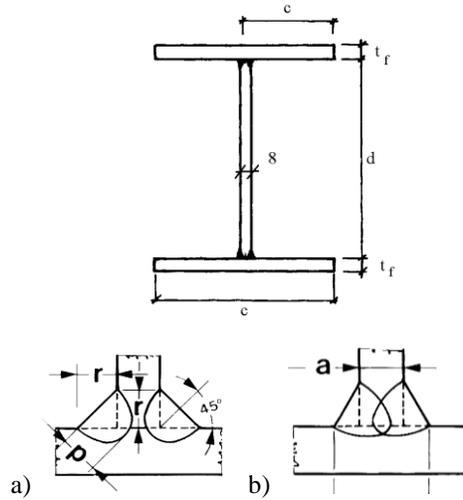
Welded I sections with a) fillet weld type, b) penetrated welds
